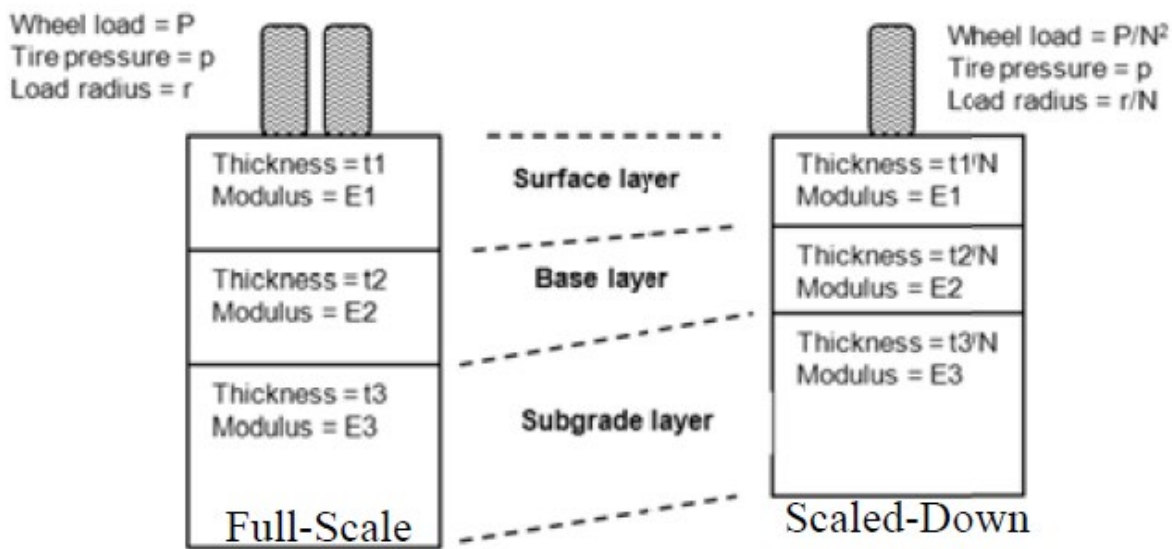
Full-scale and scaled-down pavement structure equivalency
